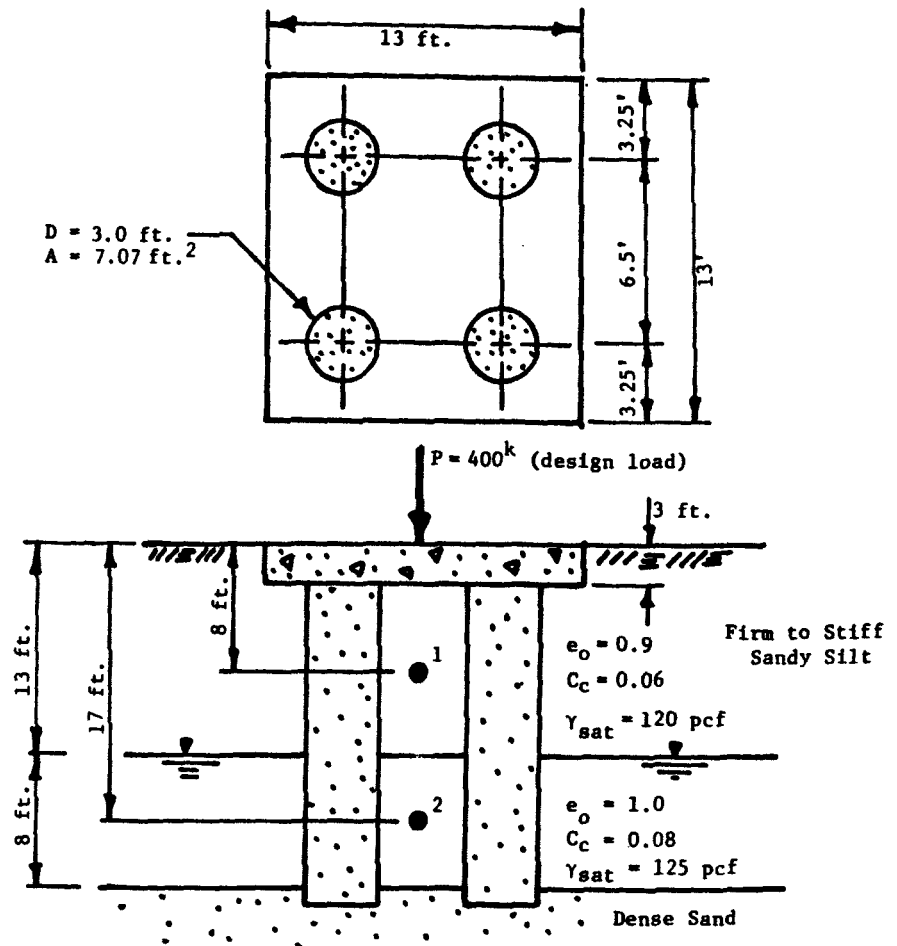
SETTLEMENT EXAMPLE 2 - RIGID FOUNDATION PLACED OVER STONE COLUMN IMPROVED SANDY SILT.
